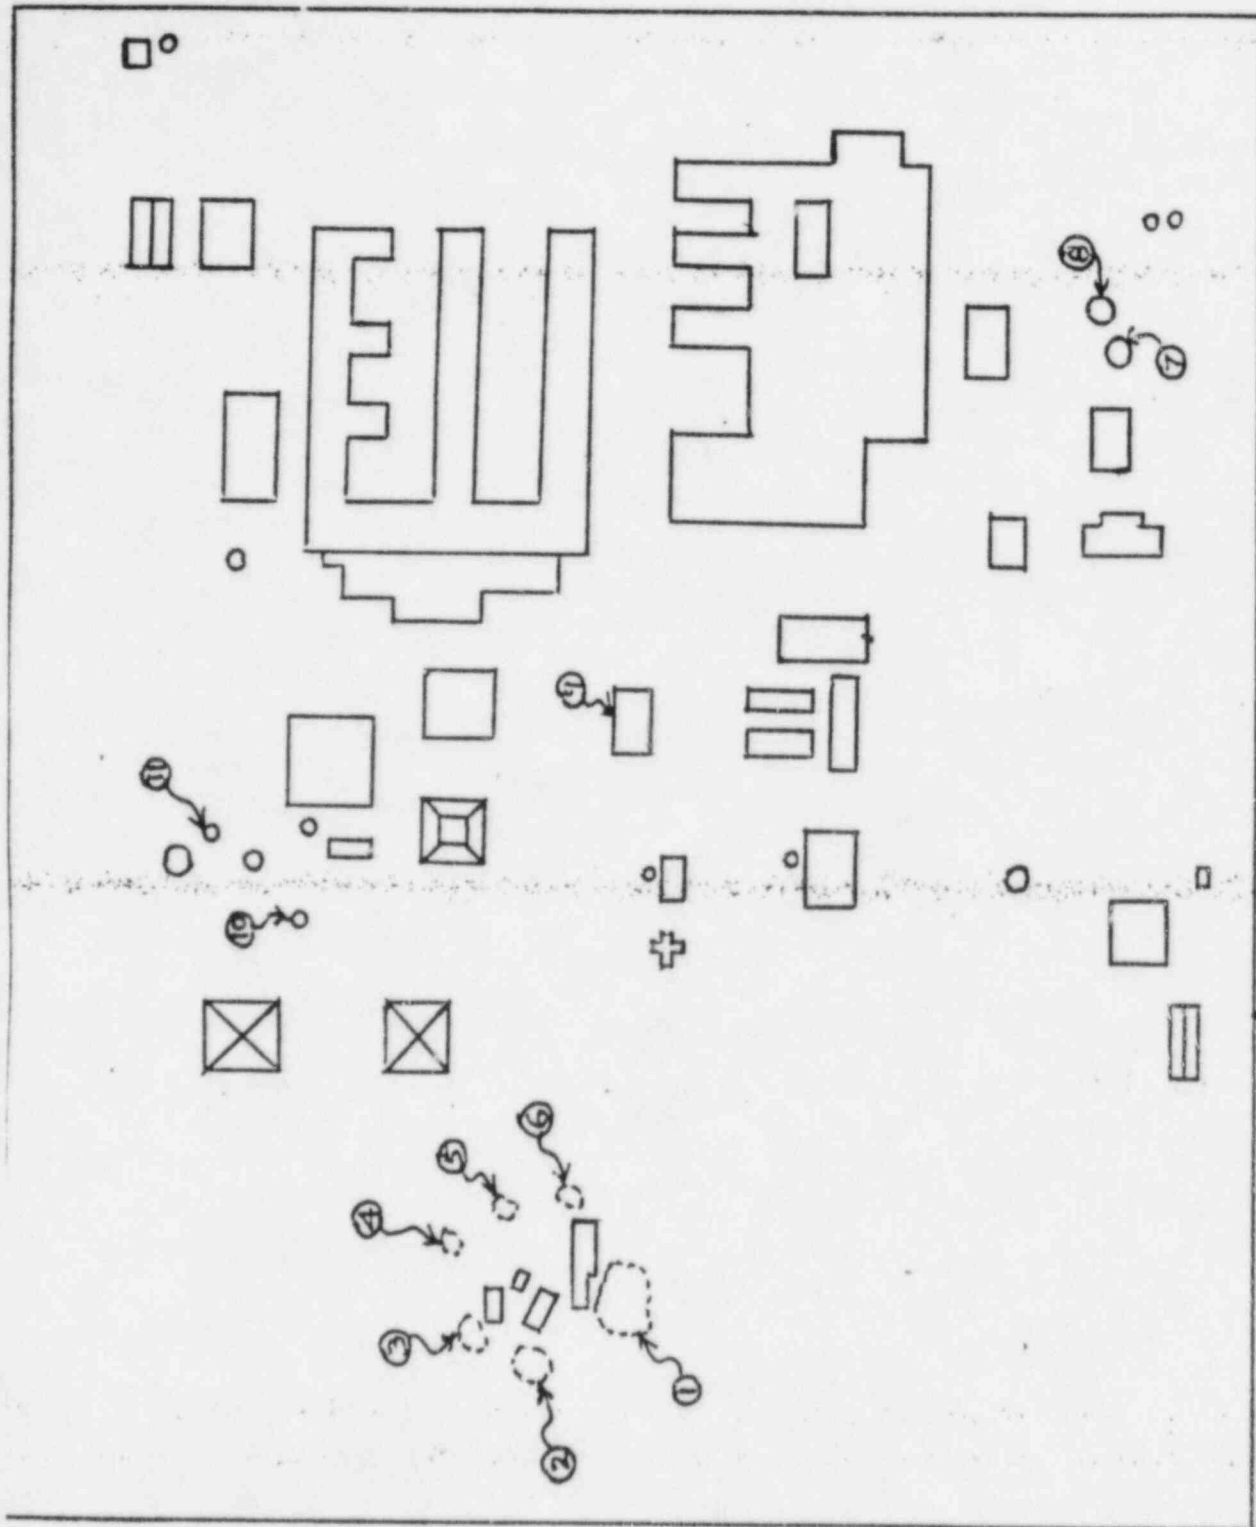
X & Y SURVEY OF BUILDING J ROOF AREA
